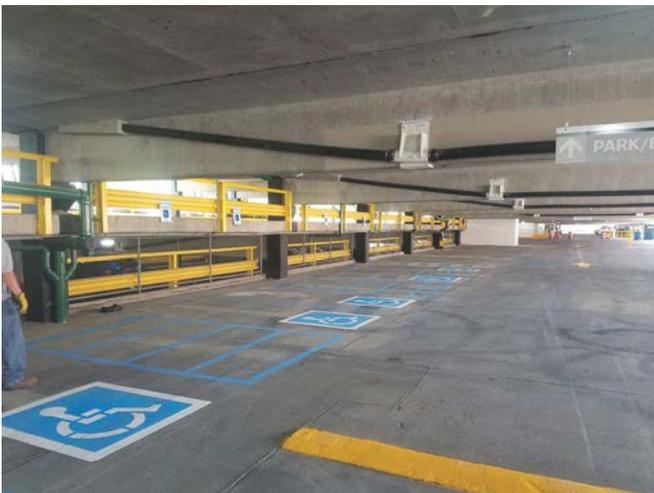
Completed repairs to beams and columns, updated drainage system, and painting observed during final project walkthrough
